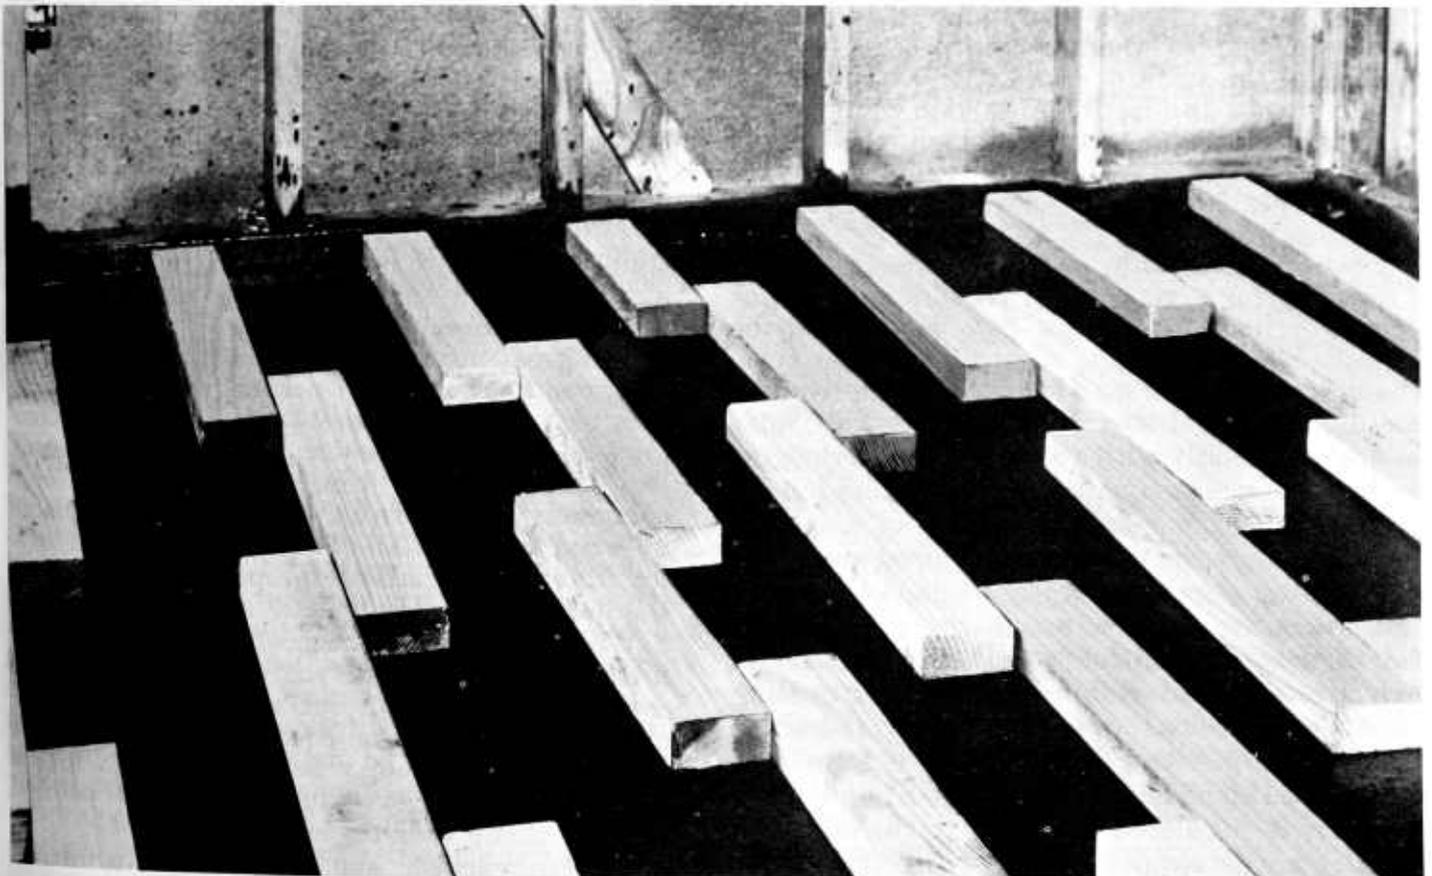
Arrangement of mastic-bonded sleepers over concrete subfloor for use in installation of nailed strip flooring.
